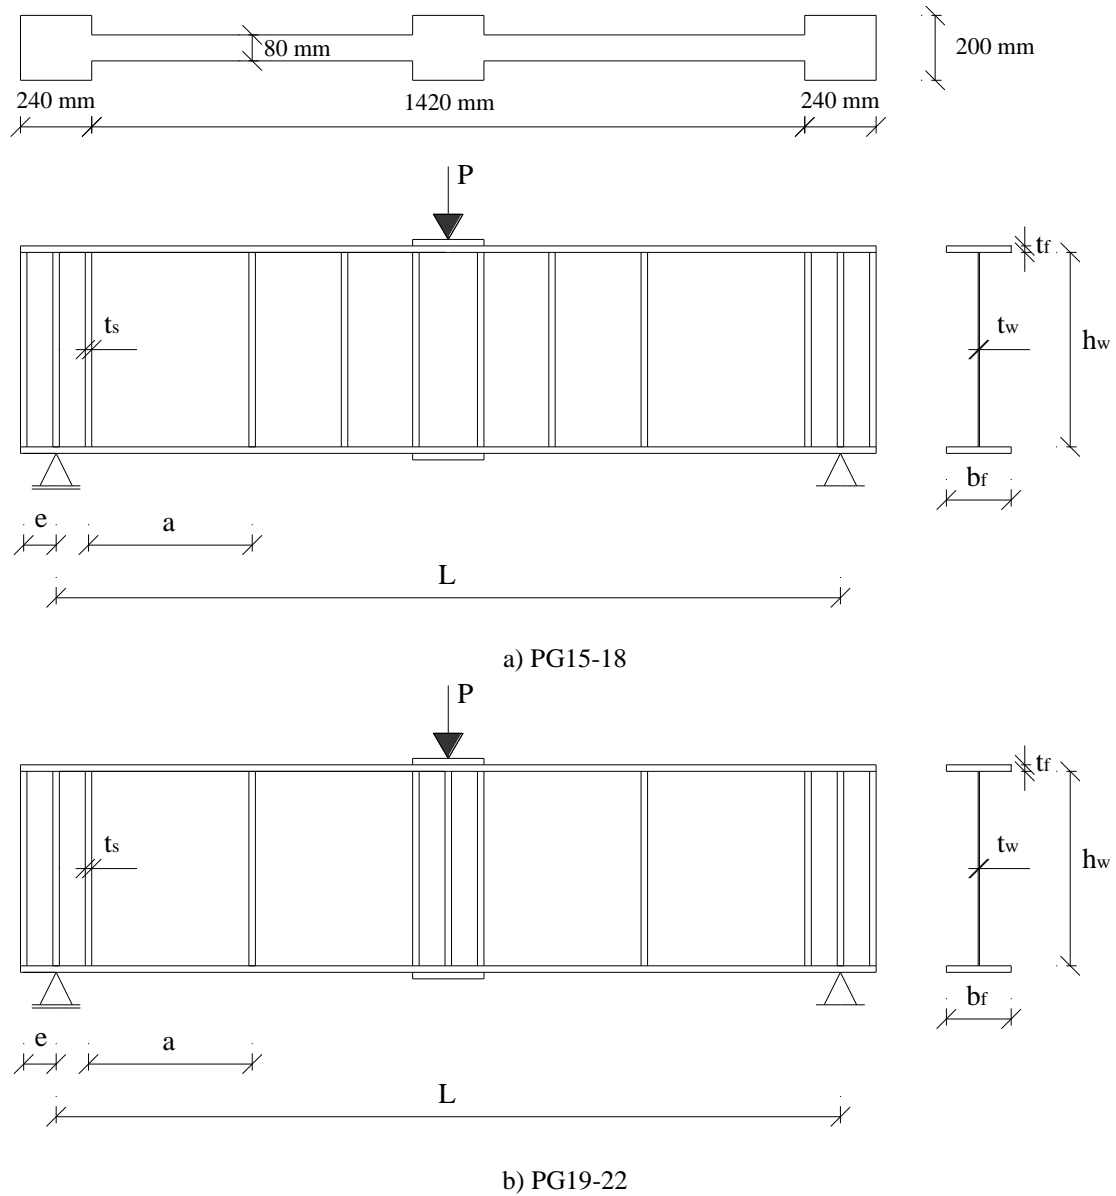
Geometry of the plate girders tested at the Nanyang Technological University
